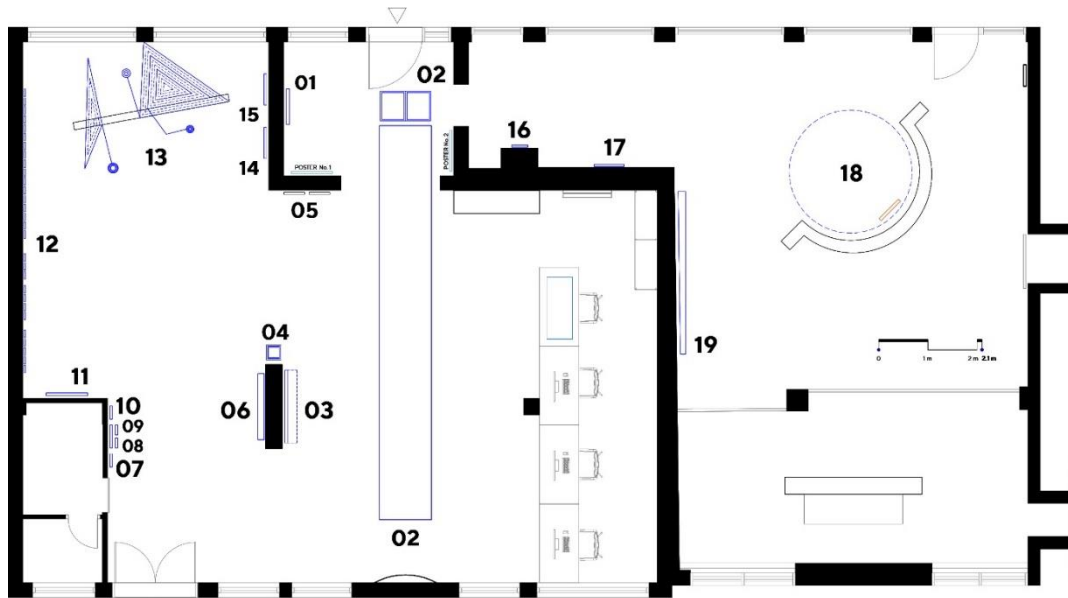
NO Concept Gallery* during the setting of the exhibition Art Project *H3O2 Vol. 2*, floor plan of the gallery, drawing by Miloš Stojković Minić
